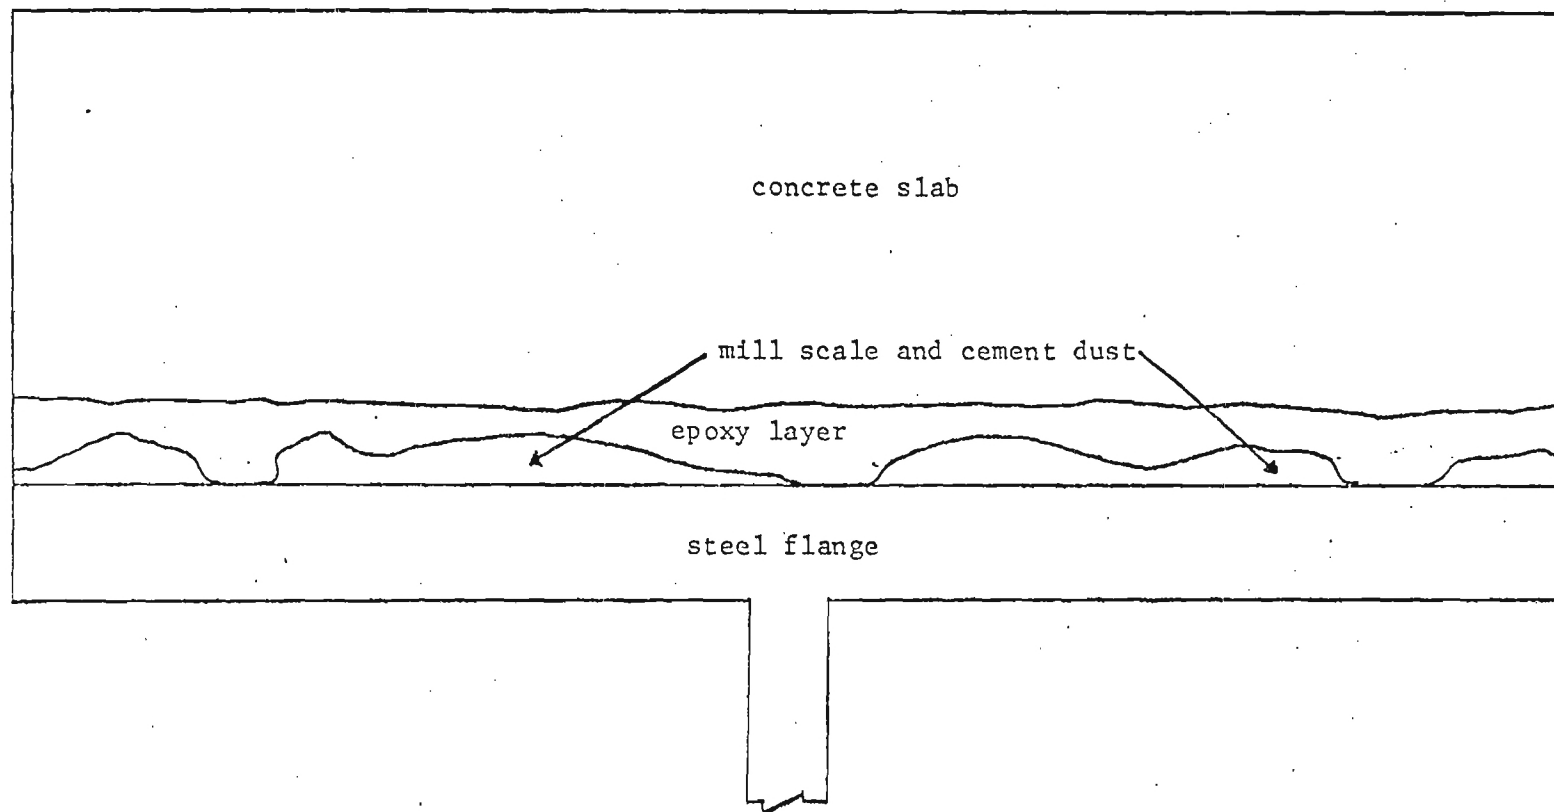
Bonding condition encountered in Beam #2 and Beam #3. Epoxy bonded to mill scale and cement dust.
